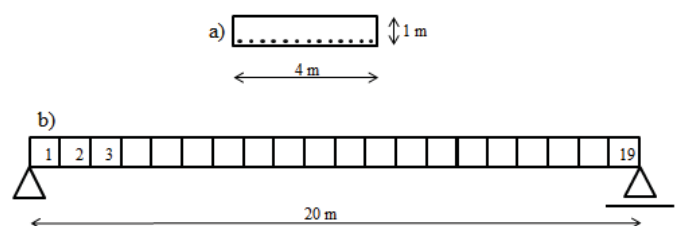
Example RC solid slab bridge's a) cross-section and b) longitudinal view.
